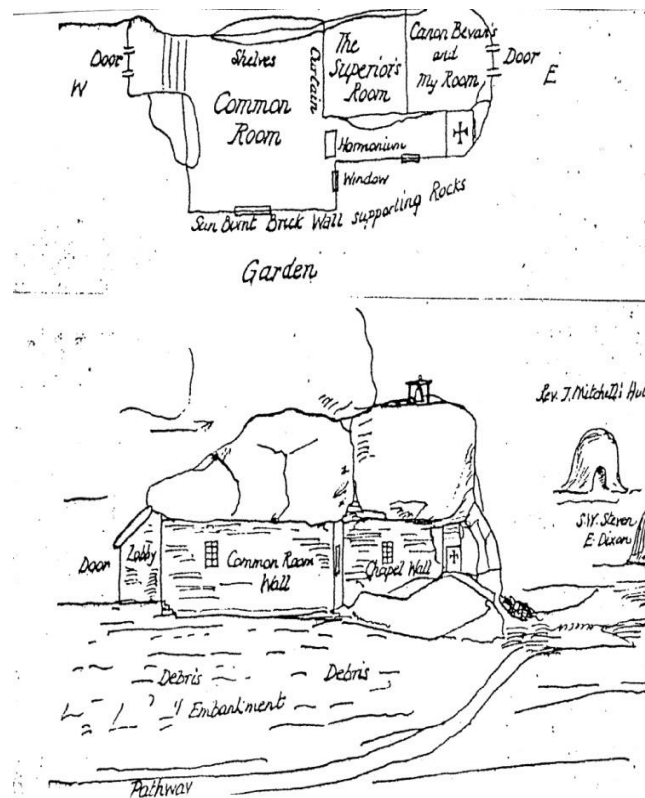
Sketch by Rev. J.W. Barrow, floor plan of the Mantsope cave
